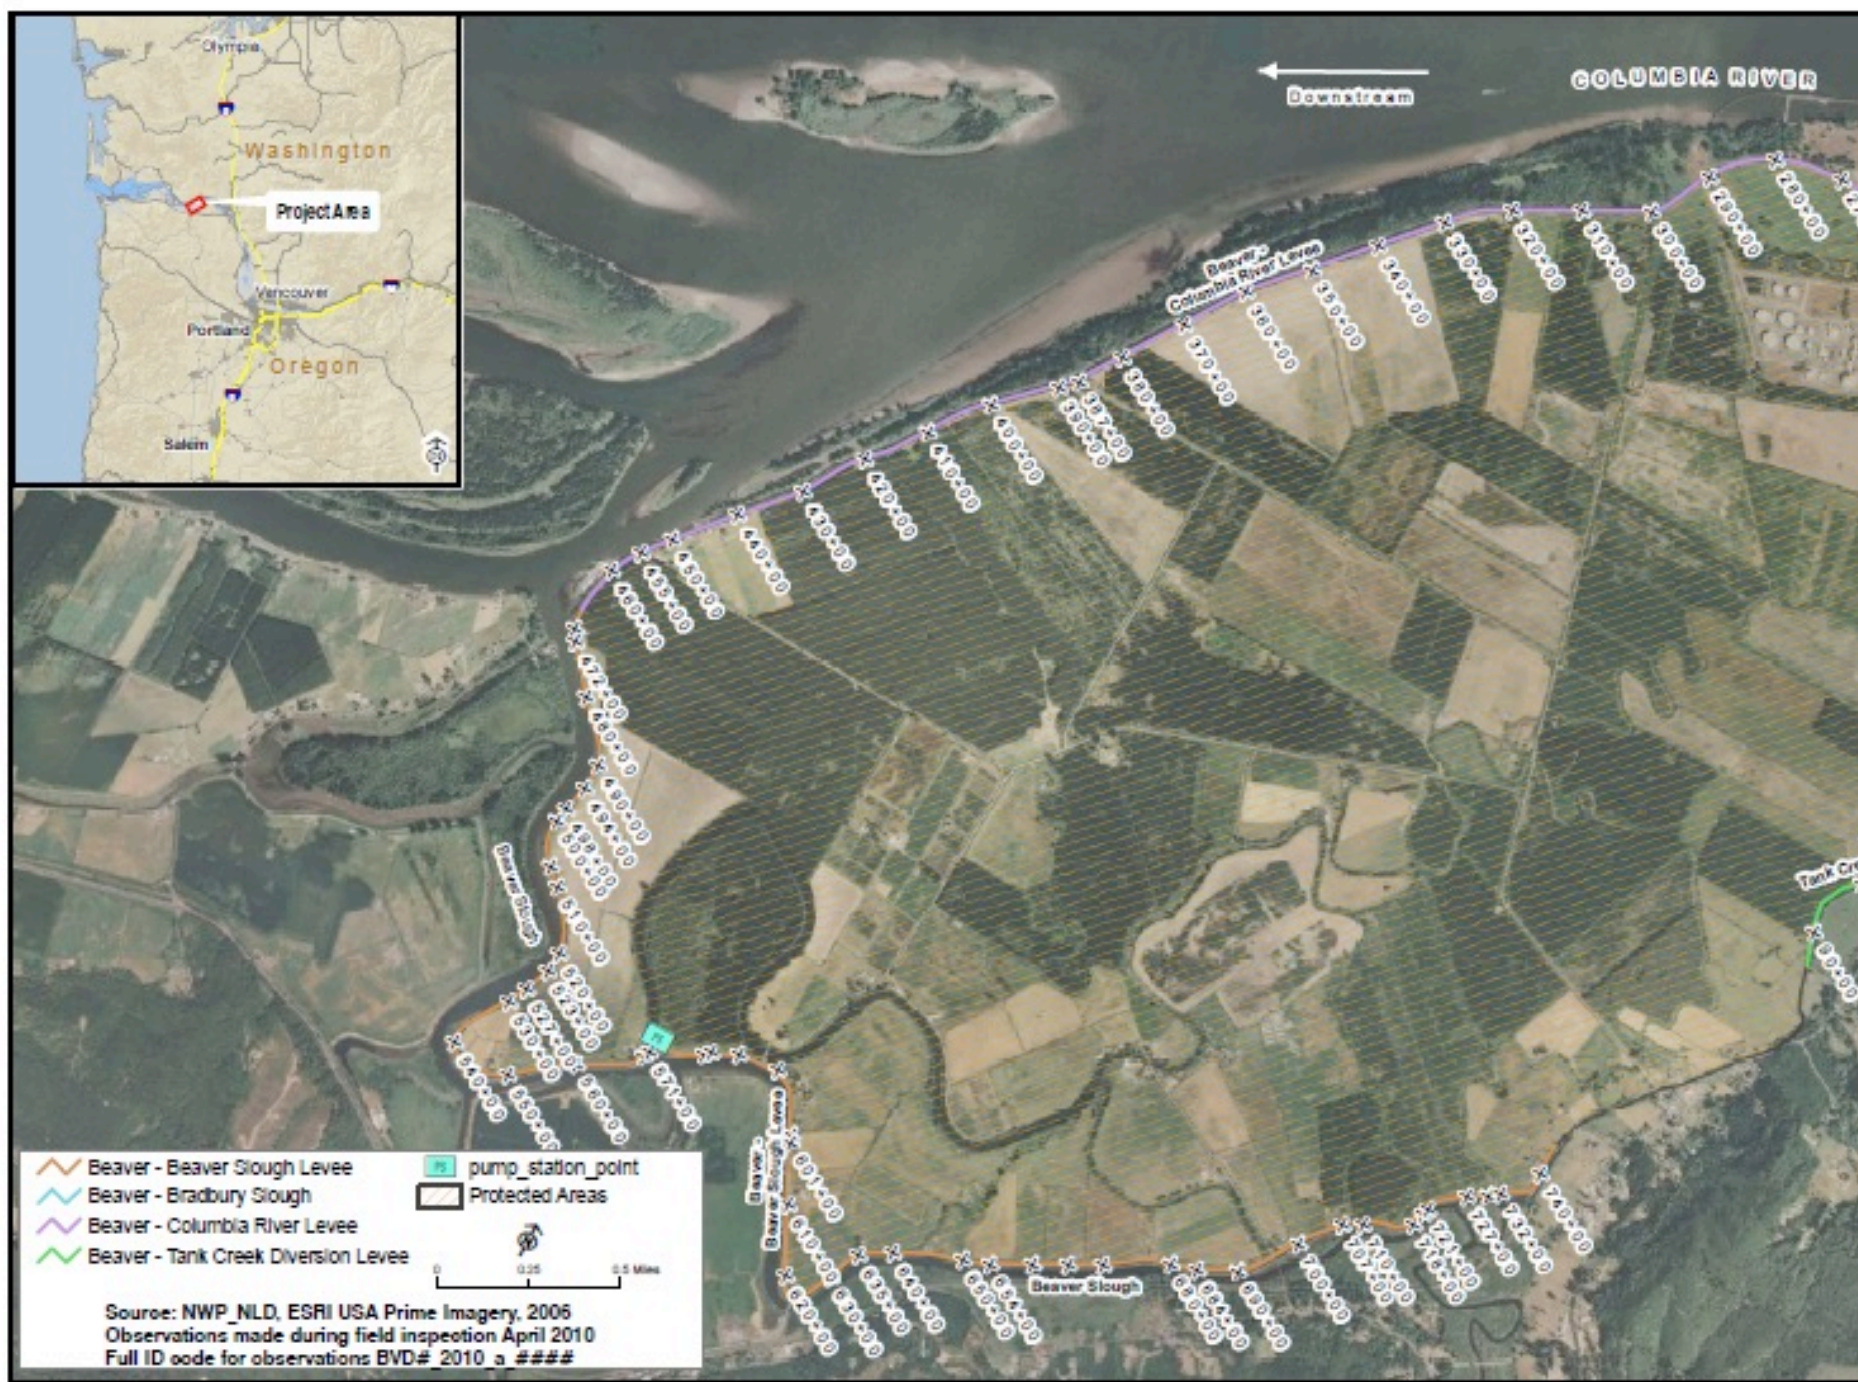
Site plan of the Beaver Drainage District Flood Reduction System
